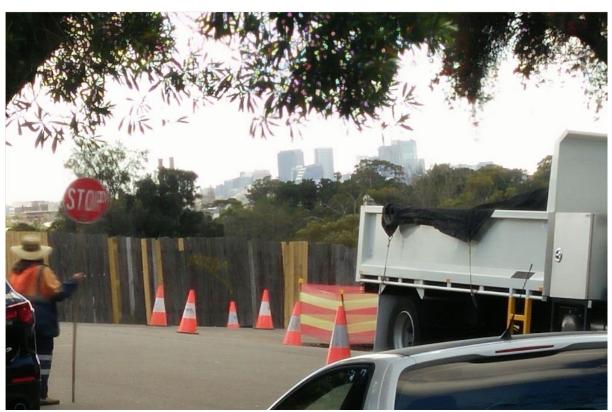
Figure R - View from front yard of No. 32 Emma Street (photo from objector)
